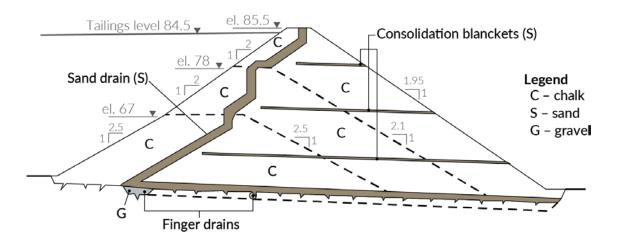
Typical section of the chalk mud storage zone and dam
